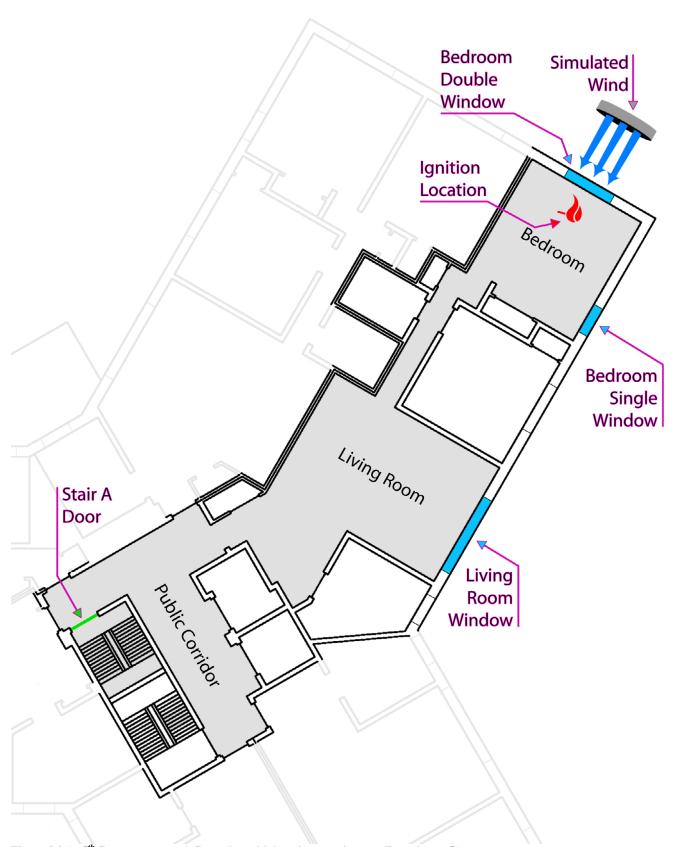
5th floor apartment A floor plan with locations pertinent to Experiment 5A
